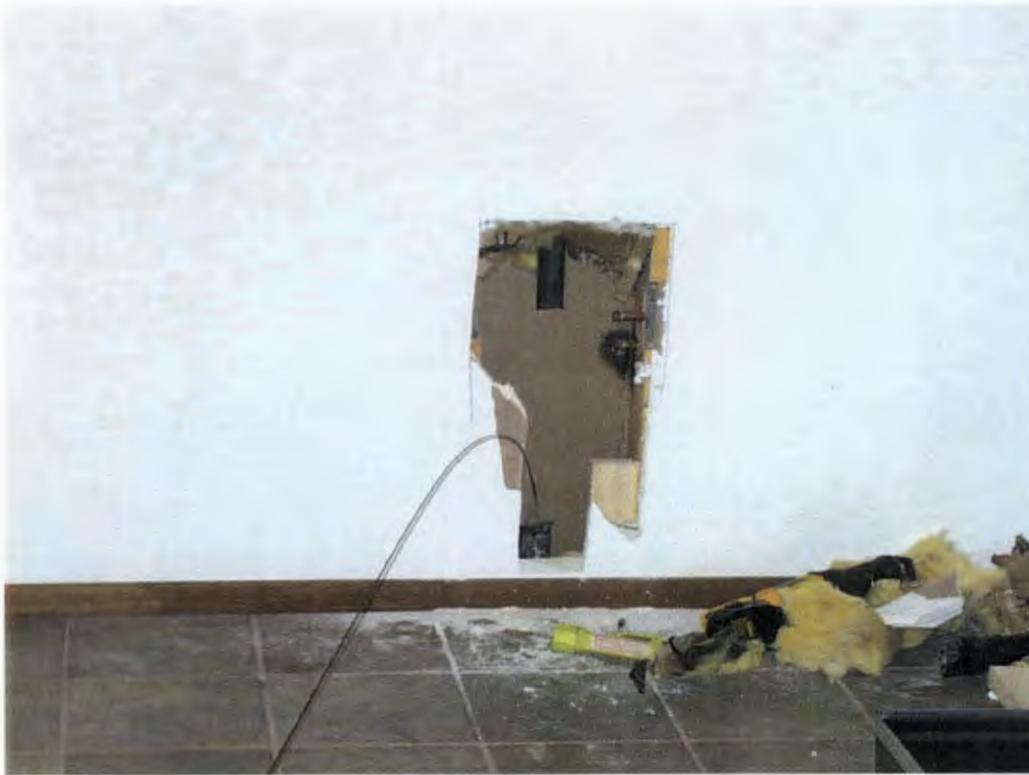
Drain line exposed that was previously connected to the sink in the former laboratory/studio, 12/8/99
